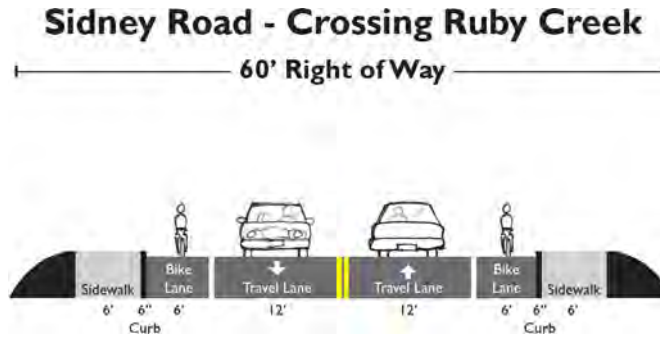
Sidney Road SW. Where Sidney Road SW crosses Ruby Creek, the road will narrow and taper to the above standard. This will minimize impacts to Ruby Creek while providing for nonmotorized connectivity. This section requires culvert replacement.
